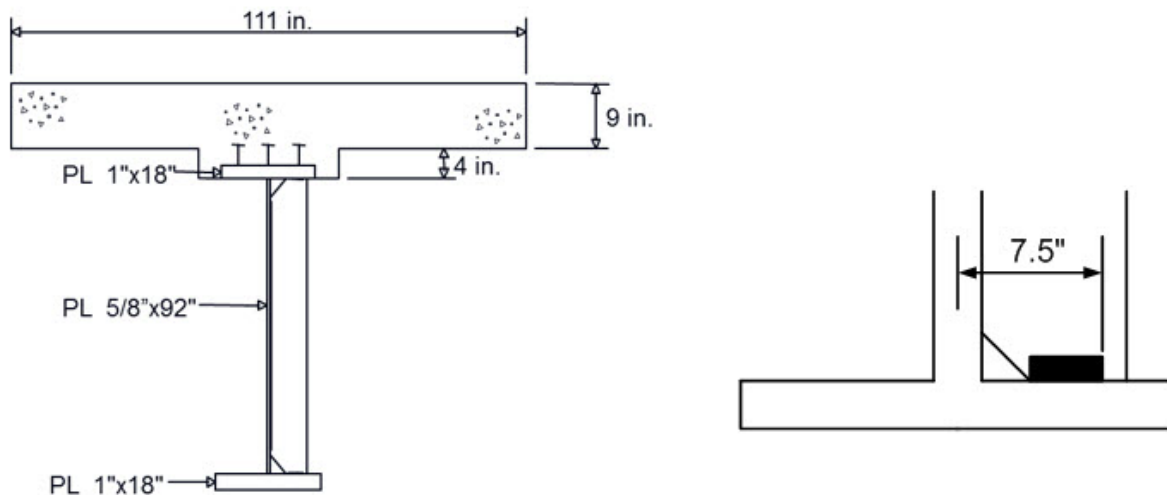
Bottom flange weld subject to in-plane and lateral flange bending.
